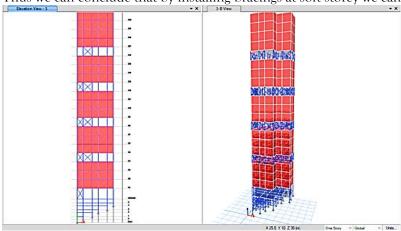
Elevation & 3D view of the building with bracing at 4th+8th+12th & alternate at (G+16th) floors on 25° sloping ground
